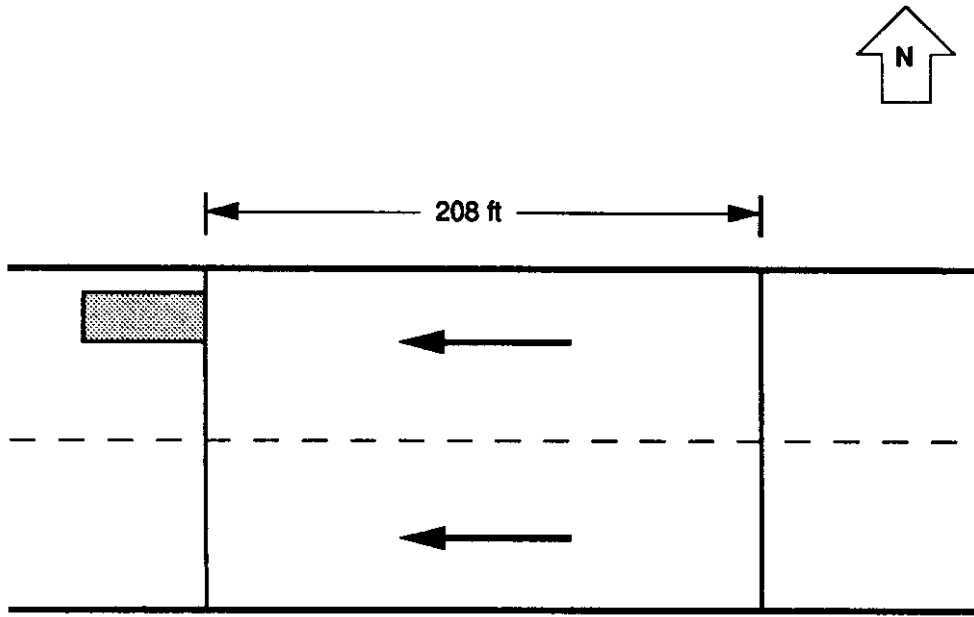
Location of Test Section in Westbound Travel Lane of the North First Street Overcrossing
